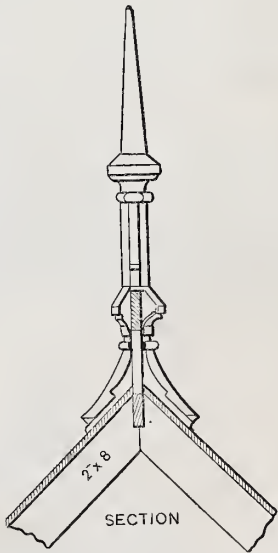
Section Through Cresting.—Scale, ¾ Inch to the Foot.
